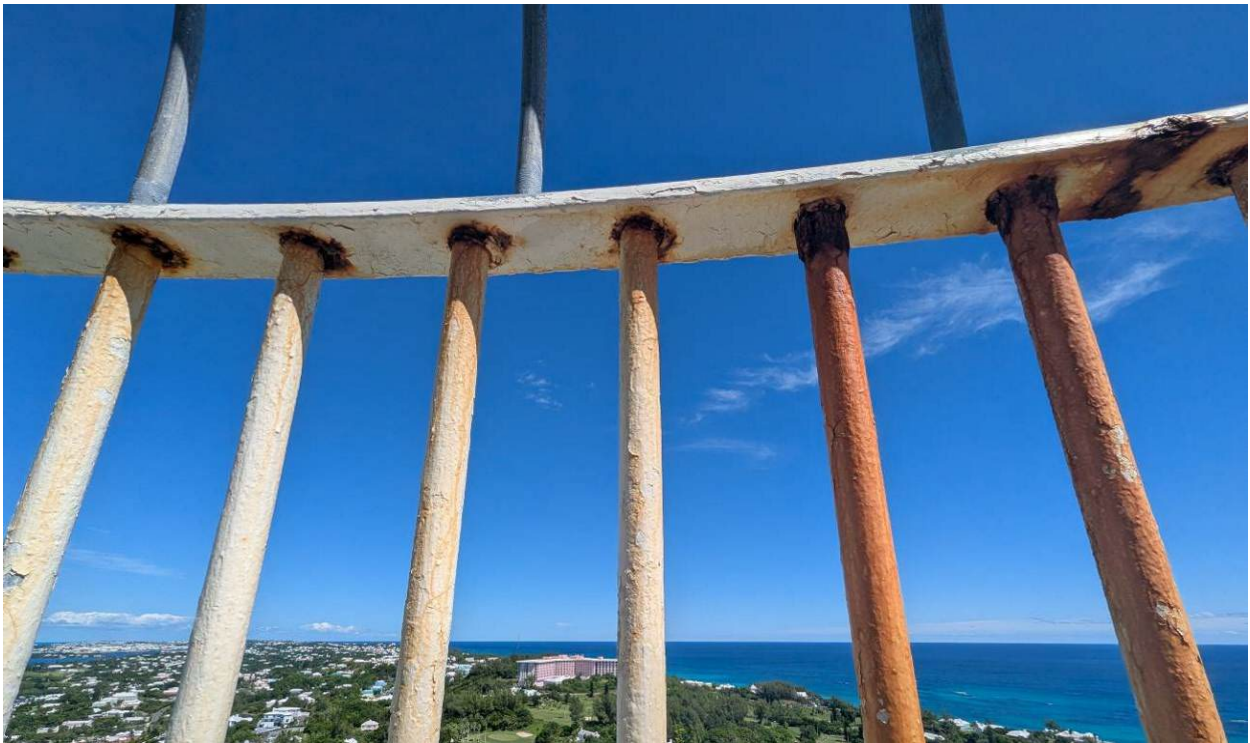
Lower railings connection to intermediate rail (Section 1)
